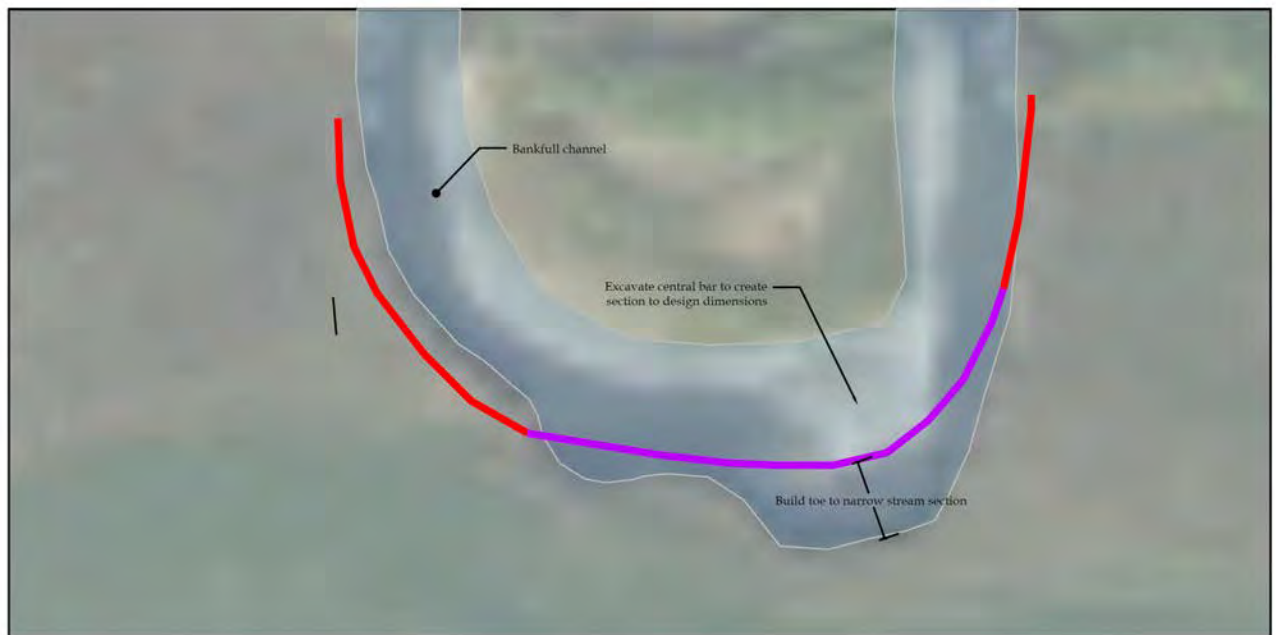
Plan view restoration example showing Scenario 1 (excavate existing terrace in locations with appropriate channel dimensions) and Scenario 2 (construct wood toe treatment in the active channel to narrow the channel in over-widened locations).
